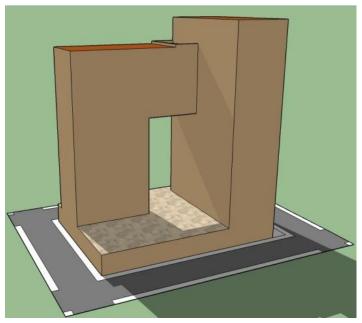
B Building has a window or void, with floors above that connect building elements on either side of the window or void
